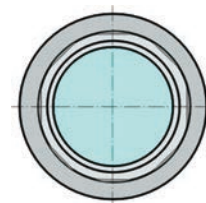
Pipe joint not pressed together, dimensions up to 42mm
